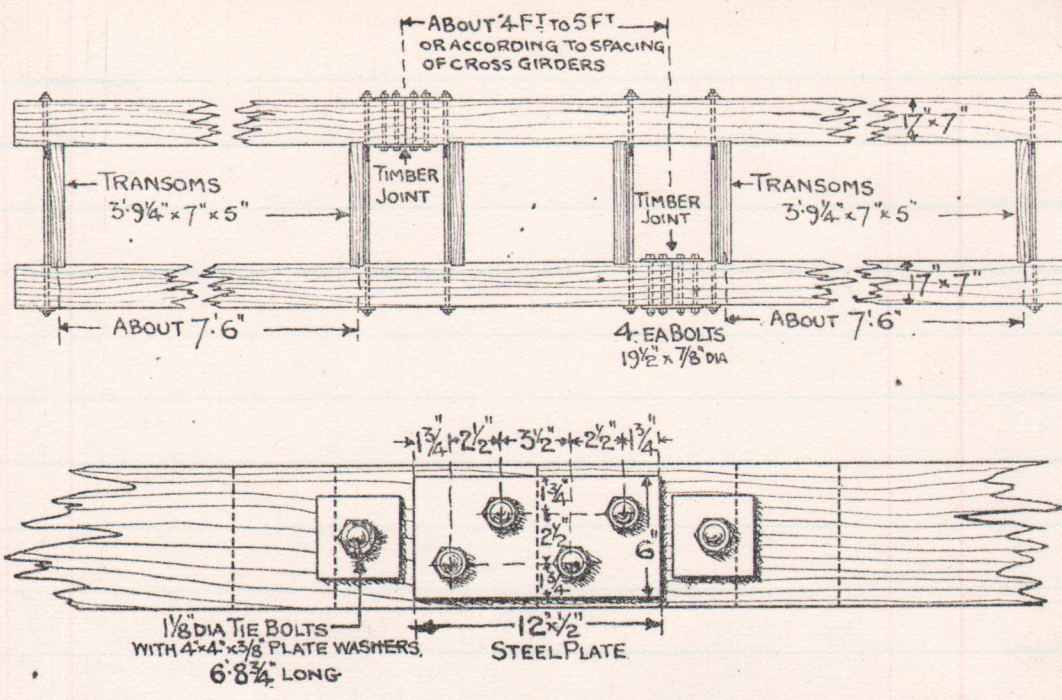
Arrangement of Joints on Bridges with Longitudinal Track Timbers.
